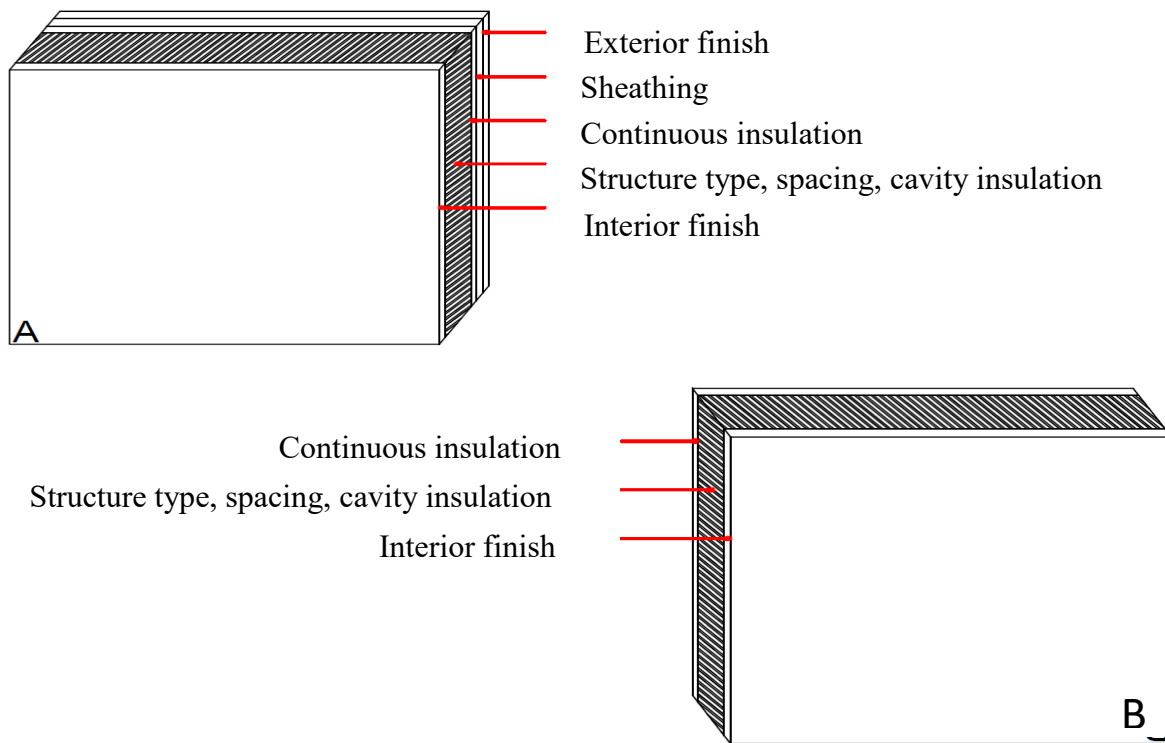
Cross section of (a) above-grade and (b) below-grade wall components (NRCan 2010b)
